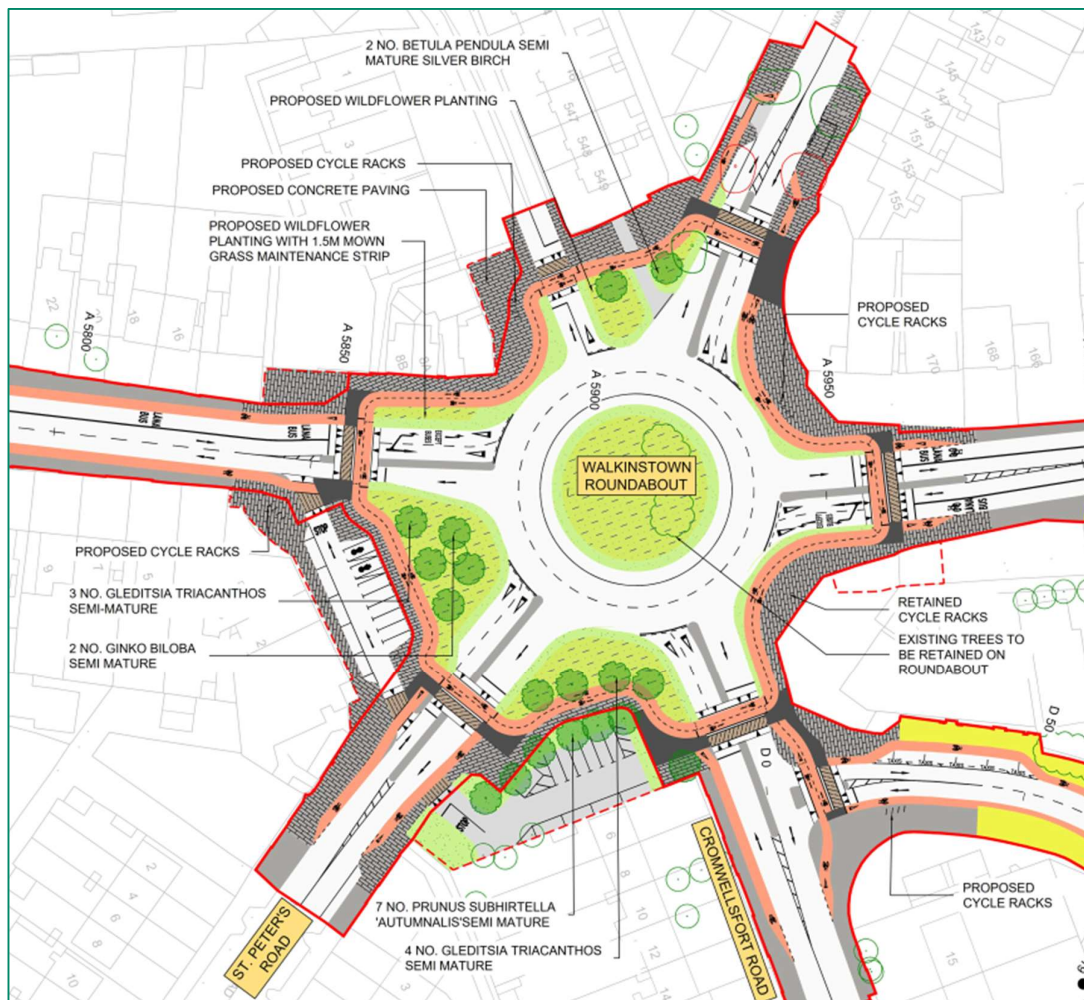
Extract from Landscape General Arrangement Drawings at Walkinstown Roundabout (Sheet 19)
